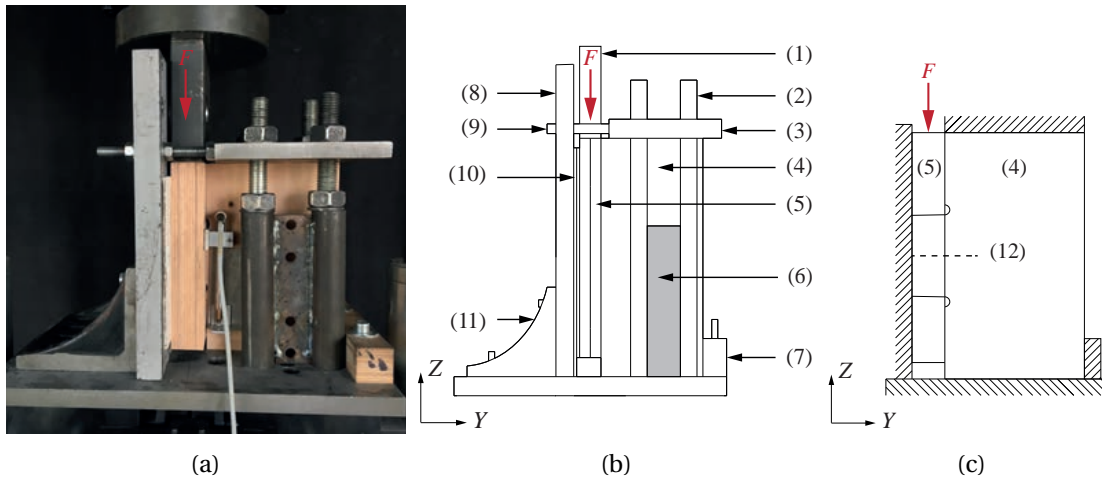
Side view of the experimental shear setup: (a) Photograph (b) Technical drawing (1) Steel plate 40 mm (2) Bolt $\varnothing 24$ mm (3) Steel plate 15 mm (4) Specimen with tenon (5) Specimen with mortise (6) Steel plate 5 mm (7) Beech LVL 40 mm (8) Steel plate 20 mm (9) Bolt $\varnothing 12$ mm (10) Two oiled Teflon sheets (11) Steel bracket 20 mm with 8 bolts $\varnothing 12$ mm (c) Schematic drawing (12) LVDTs at the axis of the connection on each side of the specimen.
